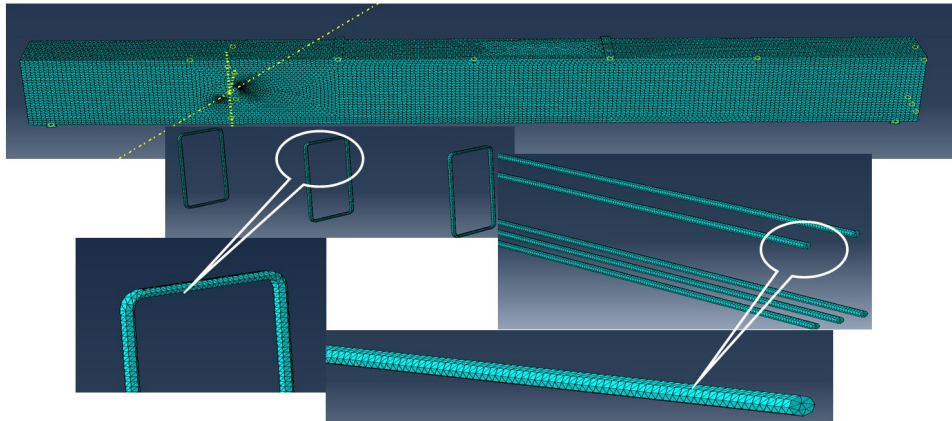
Beam and Reinforcement Assembly of 3D Finite Element Modeling.
